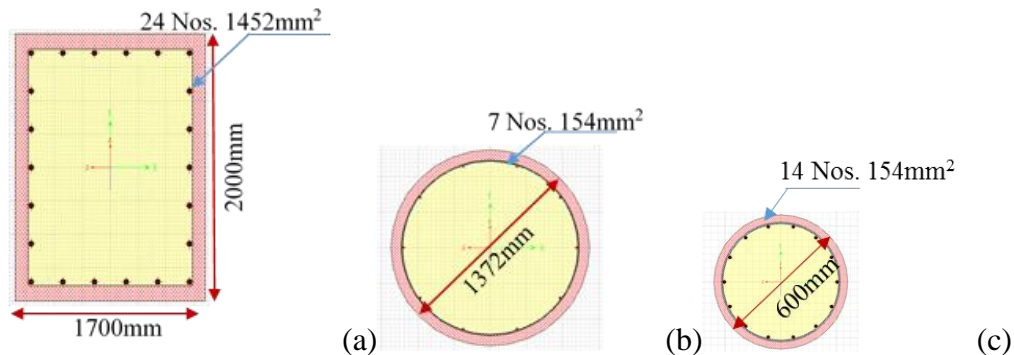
Reinforcement detailing of cross-sections for (a) pier, (b) pier piles and (c) abutment piles
